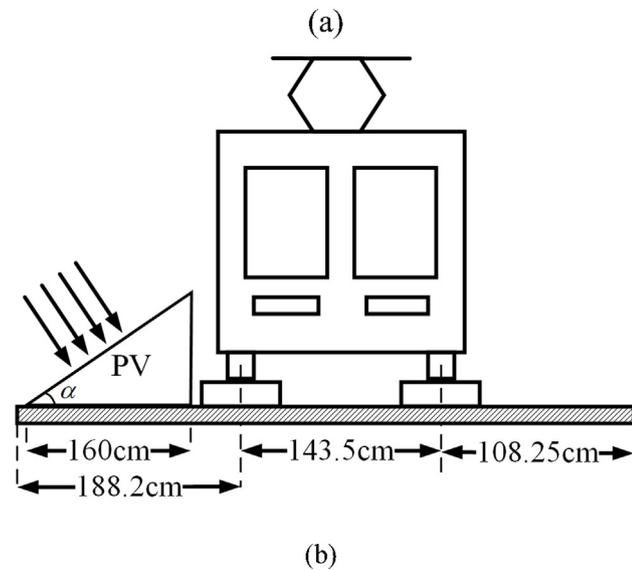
PV Installation diagram on one track side of elevated URT line (a) The track of elevated line (b) Possible PV installation location on the track side.
